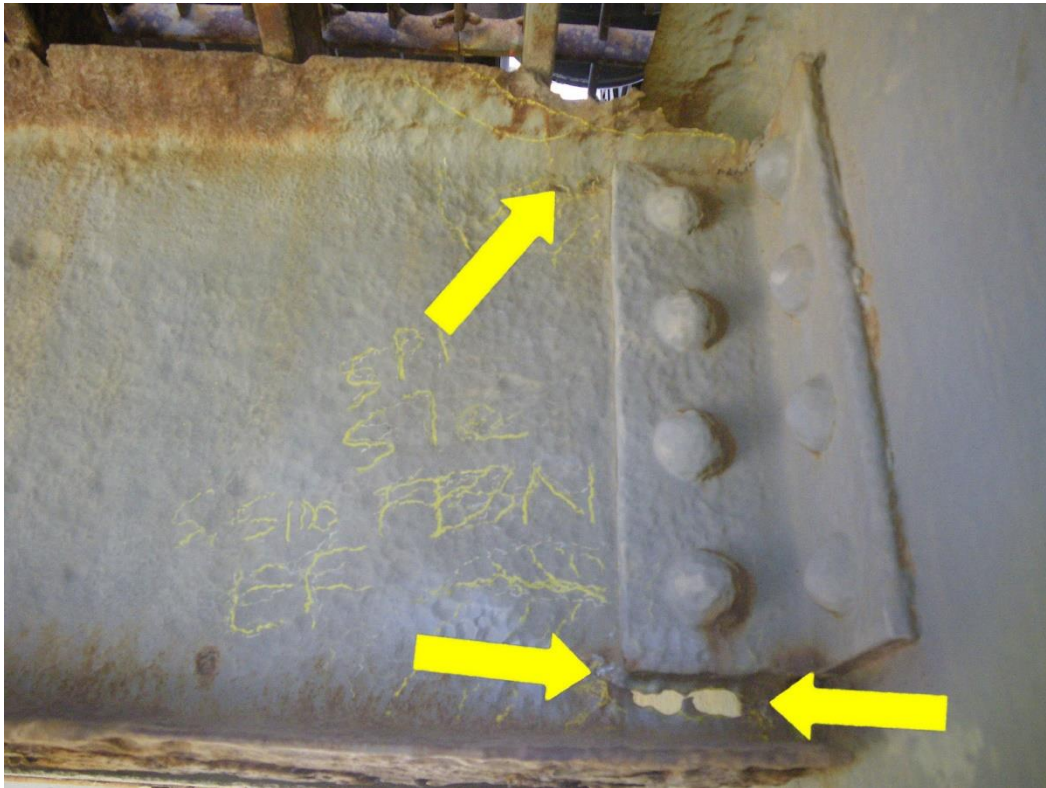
Stringer S7 at South Side of Floorbeam FB3N, East Face, Span 1 - Section loss of flanges and web including areas of 100% section loss. Note corrosion cracks in web.
